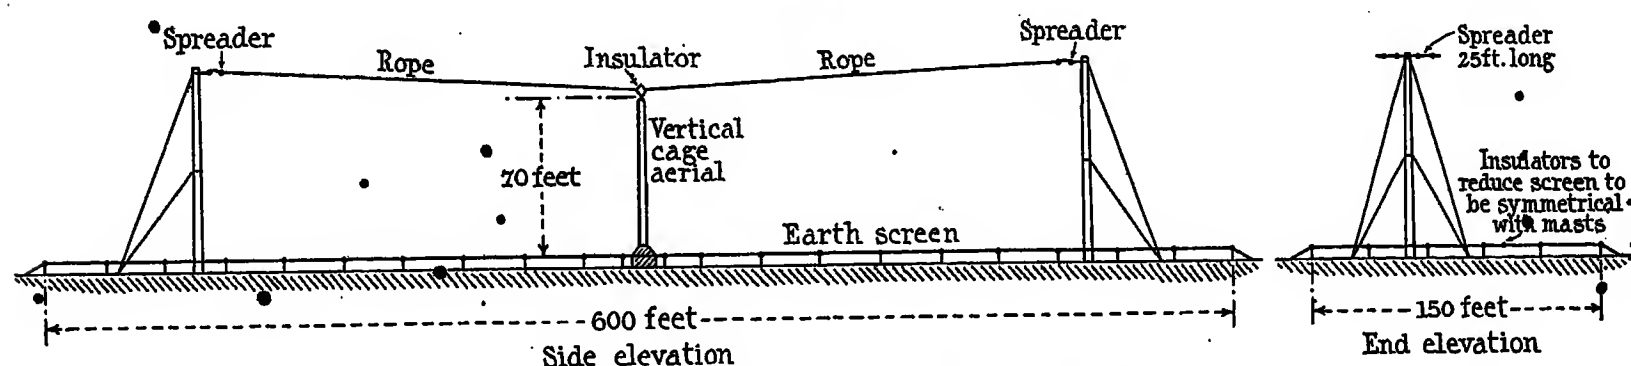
Side and end elevations of vertical-aerial arrangement.
